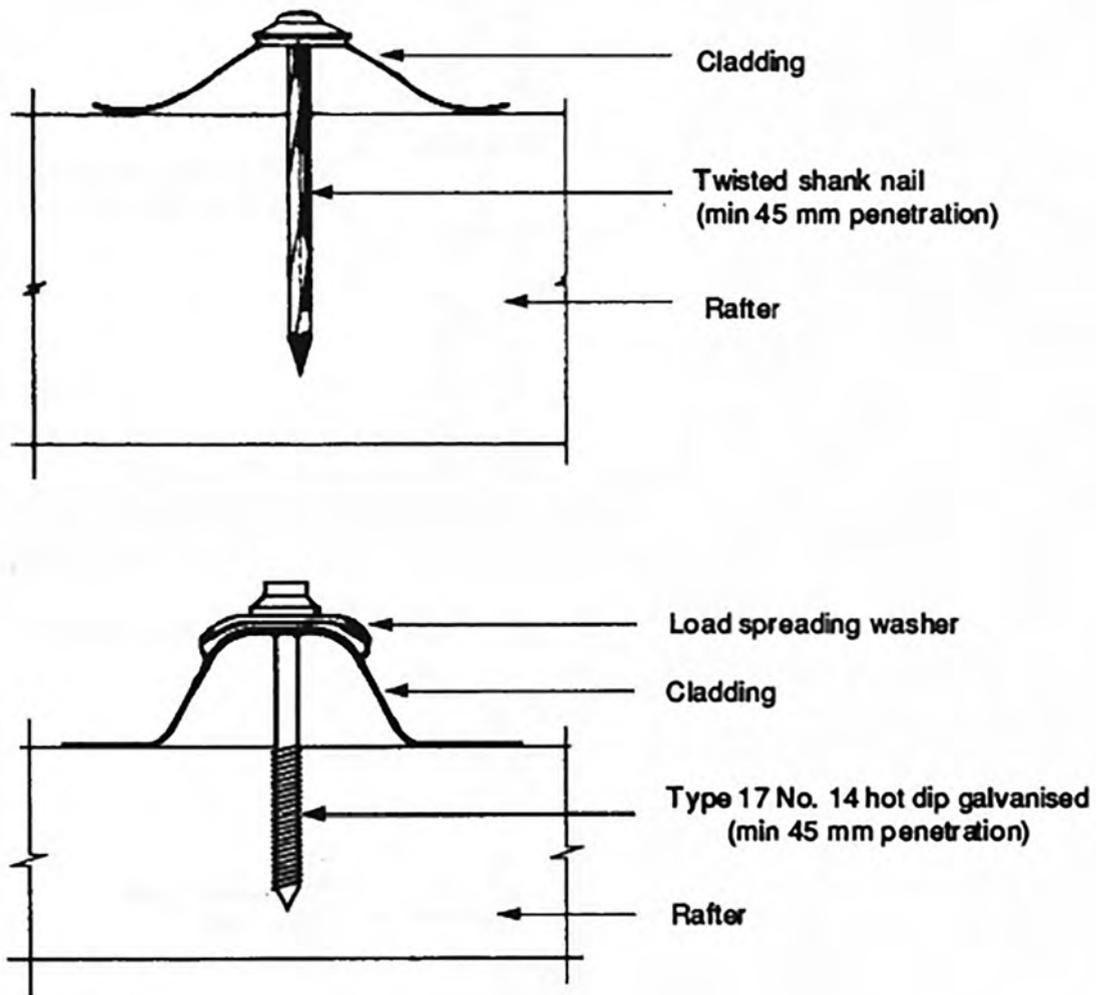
FIXING OF CLADDING TO RAFTER
